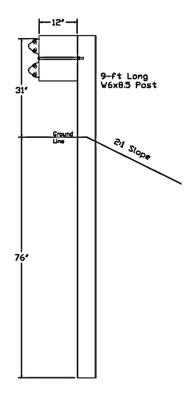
Barrier Installation, Test No. MGS221-2 [15]
